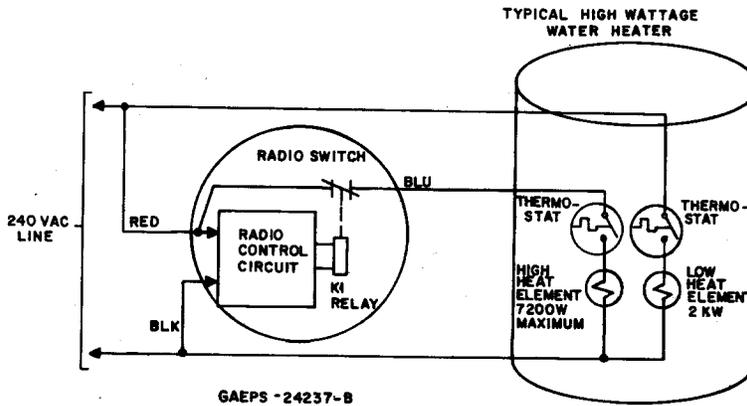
Typical 240 V ac High Wattage Heater Single Element Control, Installation Wiring
